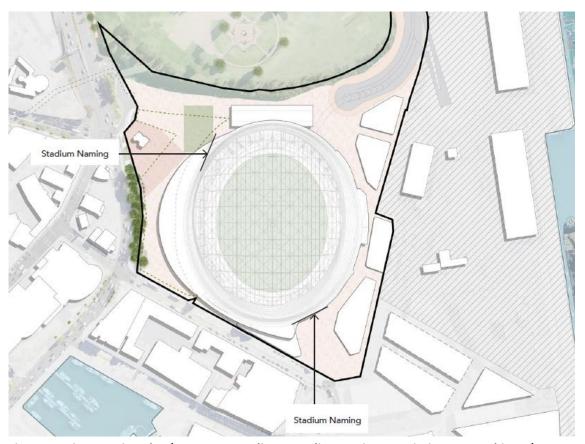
Sign Location Plan (source: Appendix B – Stadium Design Description, Cox Architects)
